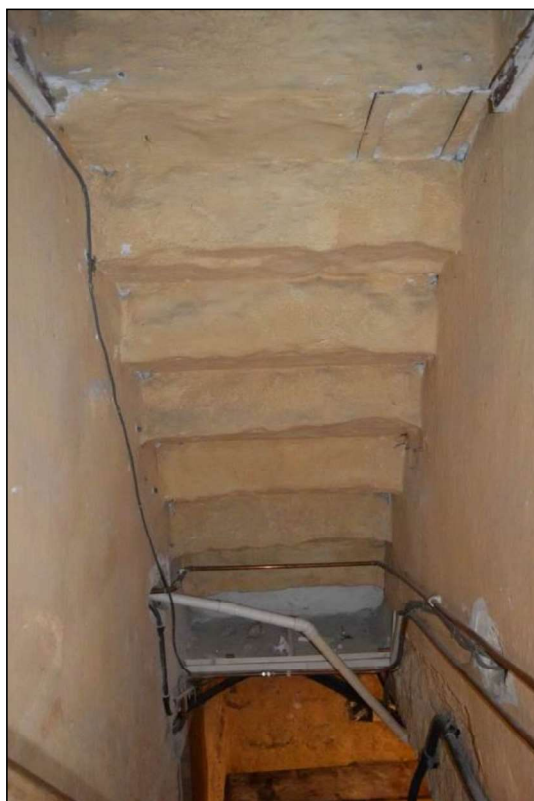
Stone steps to cellar with former window splay indicated to north elevation (facing north).
